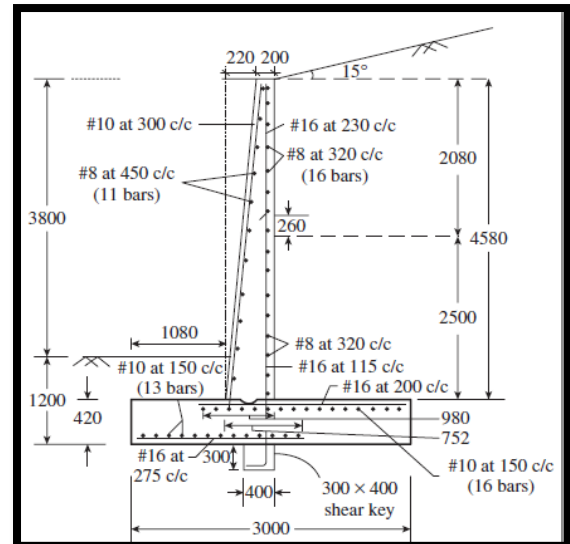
Typical Steel Reinforcement Details in a Cantilever Retaining Wall, [5]
